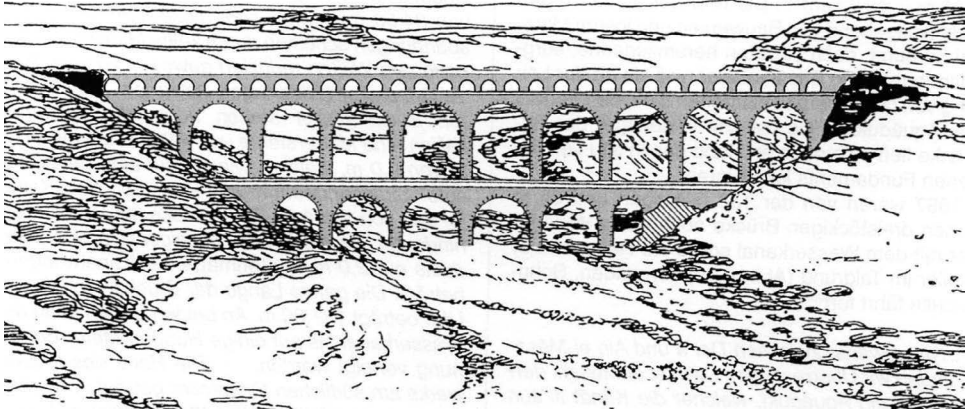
Aqueduct bridge south of Adra'a, an attempted reconstruction.
